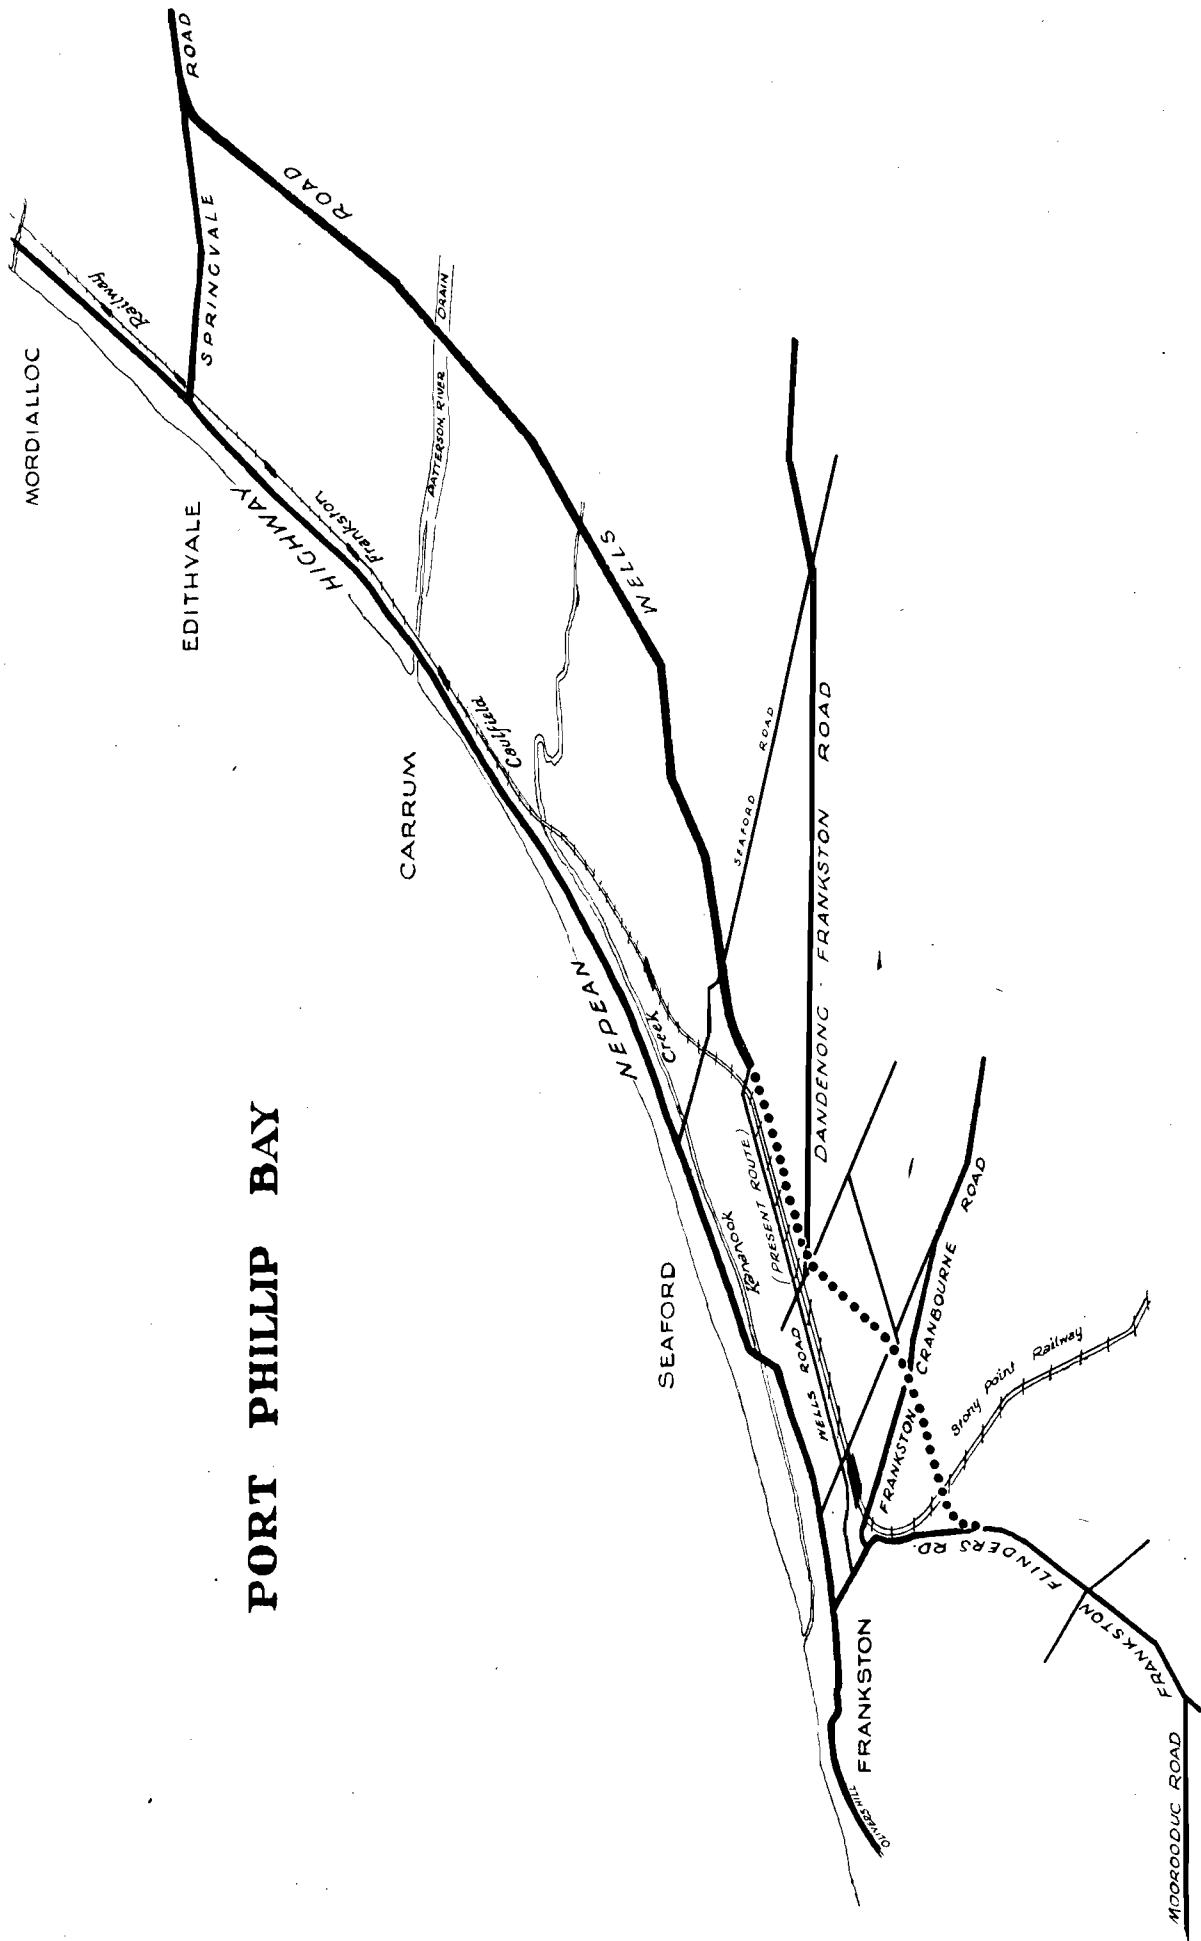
Showing proposal for development of Wells Road to provide improved traffic facilities to Mornington Peninsula. Line shows section of new road to be constructed. (Page 36).
